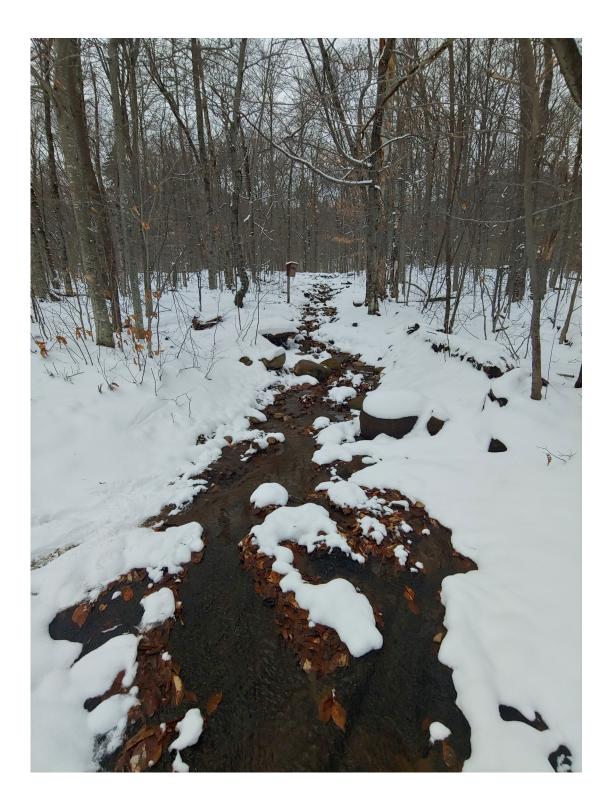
Current Panther Mountain Trailhead. The trail has become the drainage and requires rerouting
